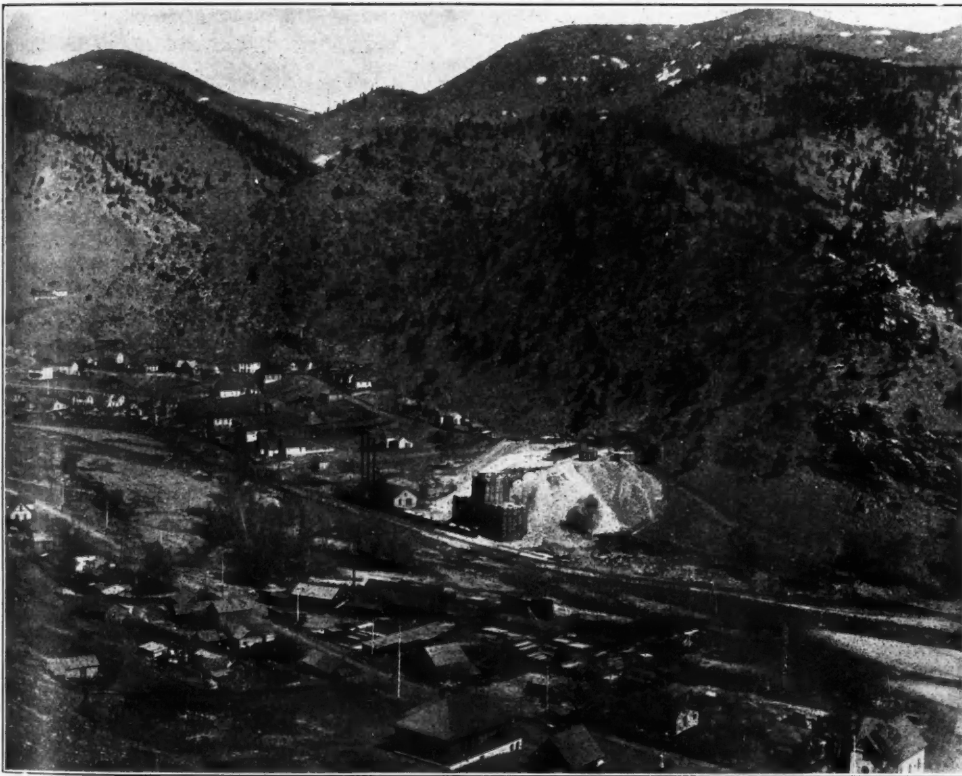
POWER-HOUSE, ORE-BINS, ETC., NEWHOUSE TUNNEL.
